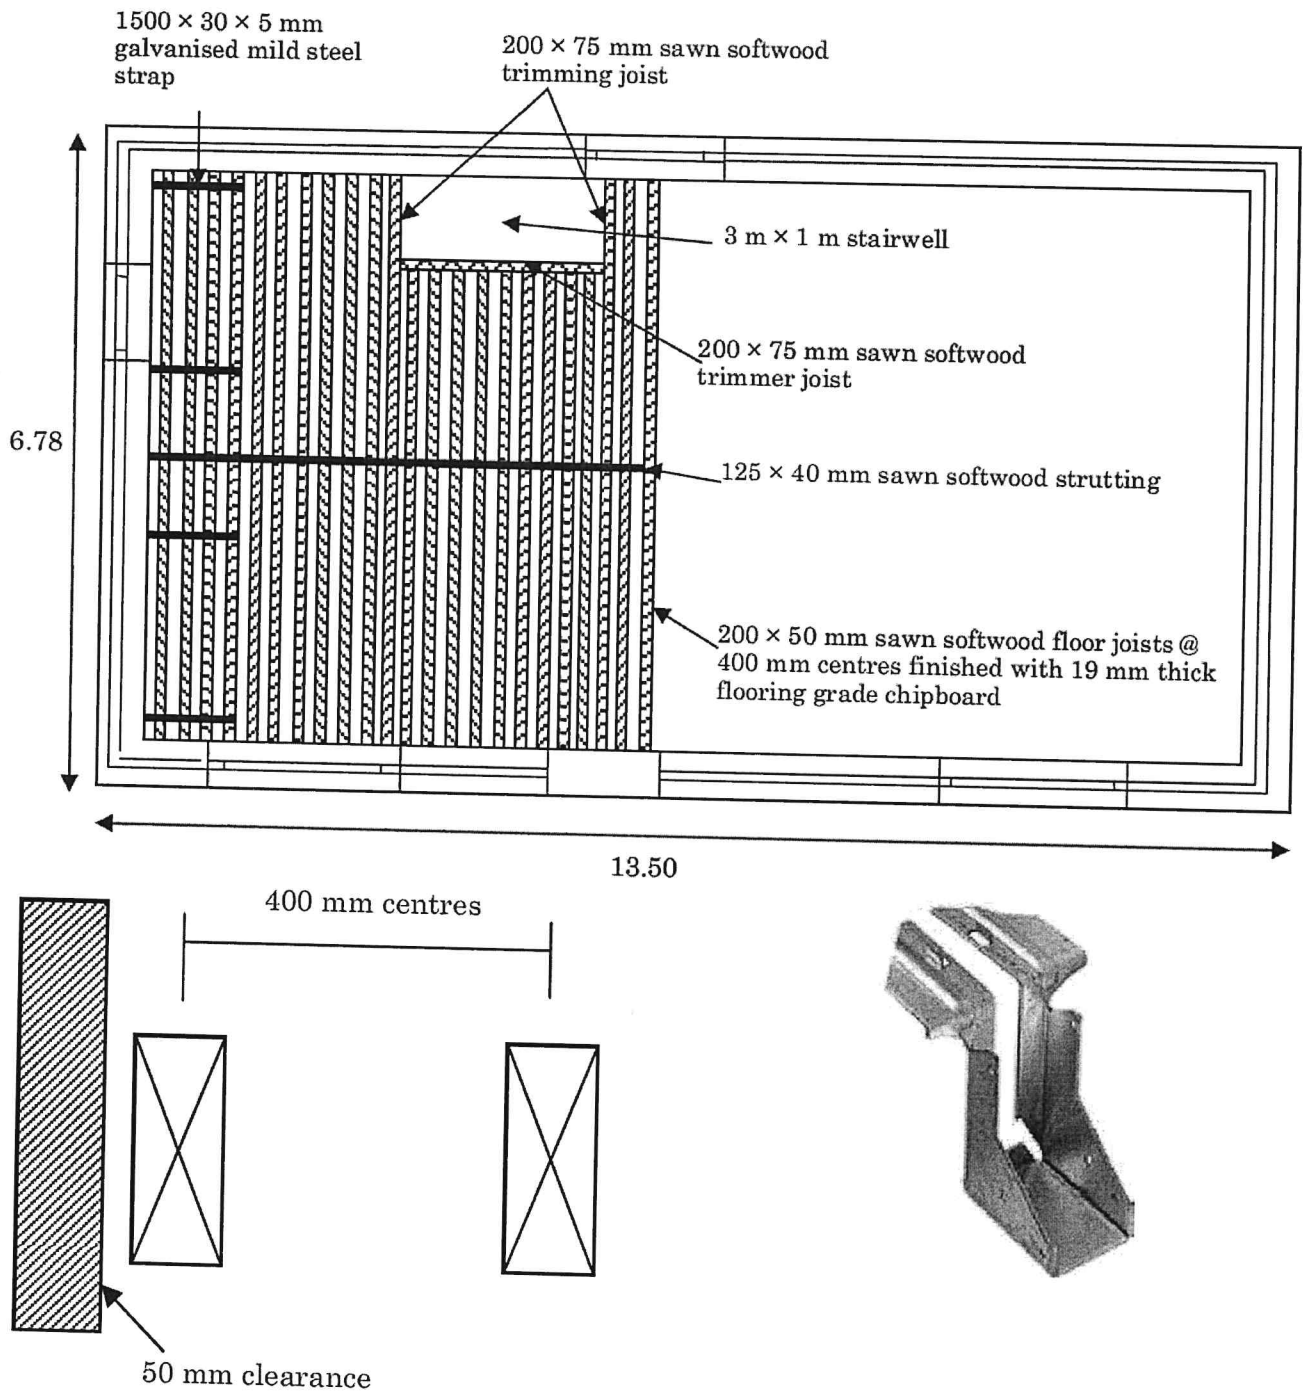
Plan showing upper floor joists layout plan, joist section detail and the type of galvanised mild steel joist hanger used.
